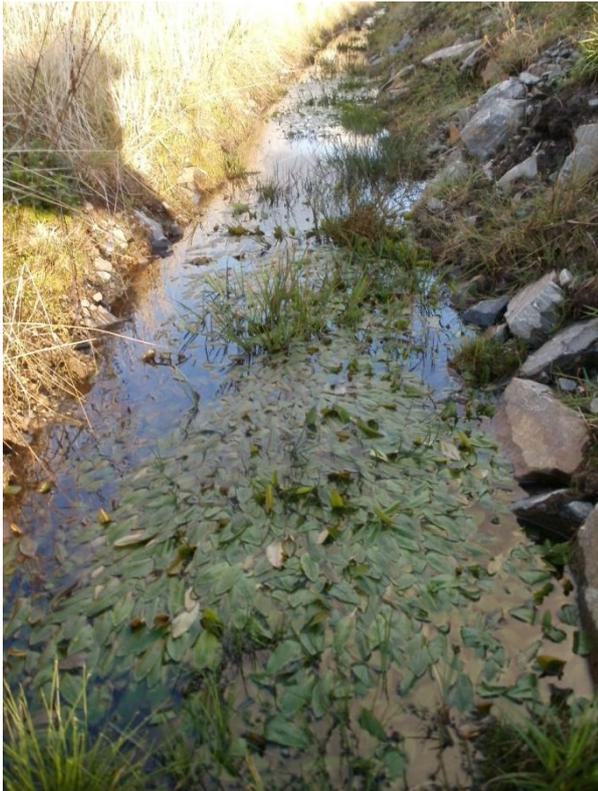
Off-road cycleway with over-the-edge drainage and ditch
